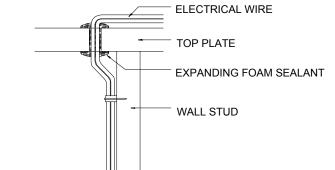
DETAIL AIR SEAL CHASE WALL NON SCALE
